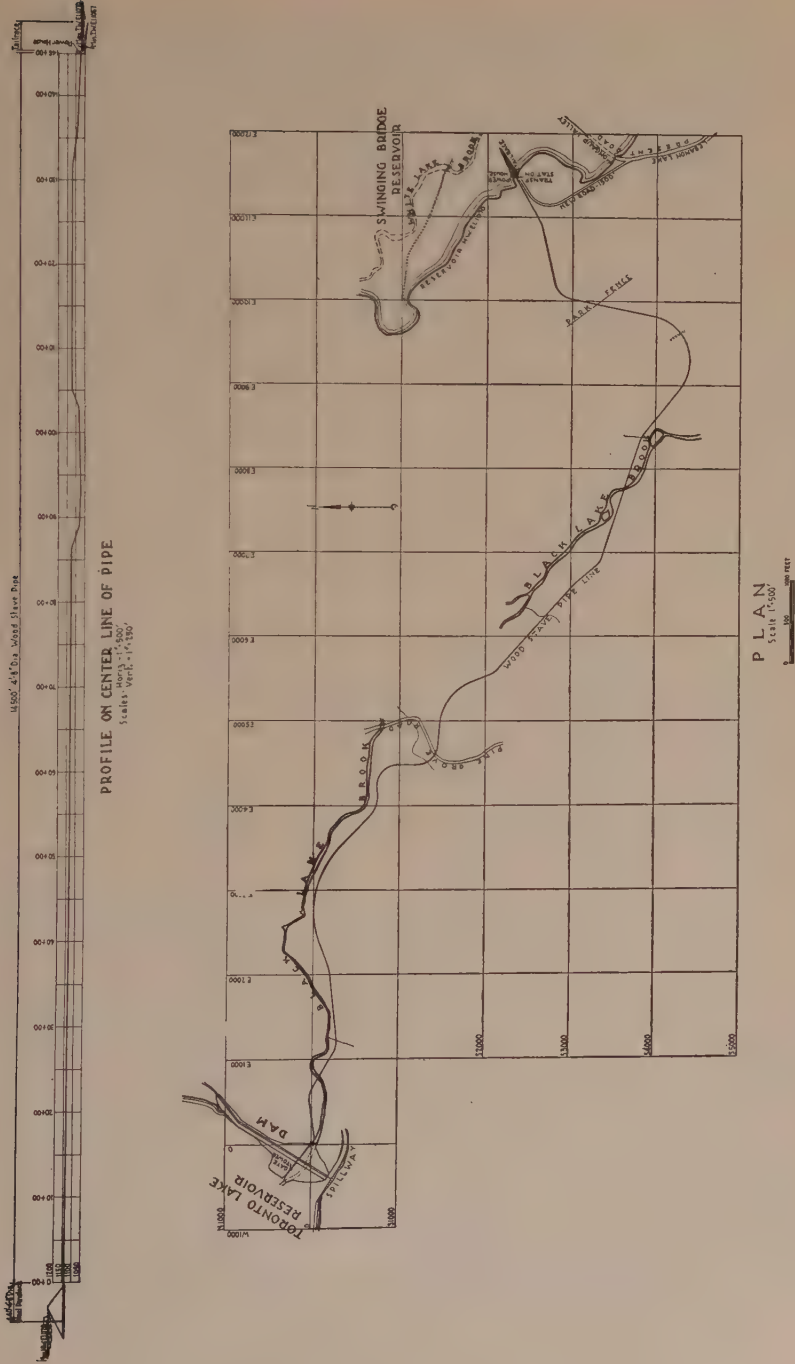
TORONTO PIPE LINE DEVELOPMENT — GENERAL PLAN AND PROFILE
